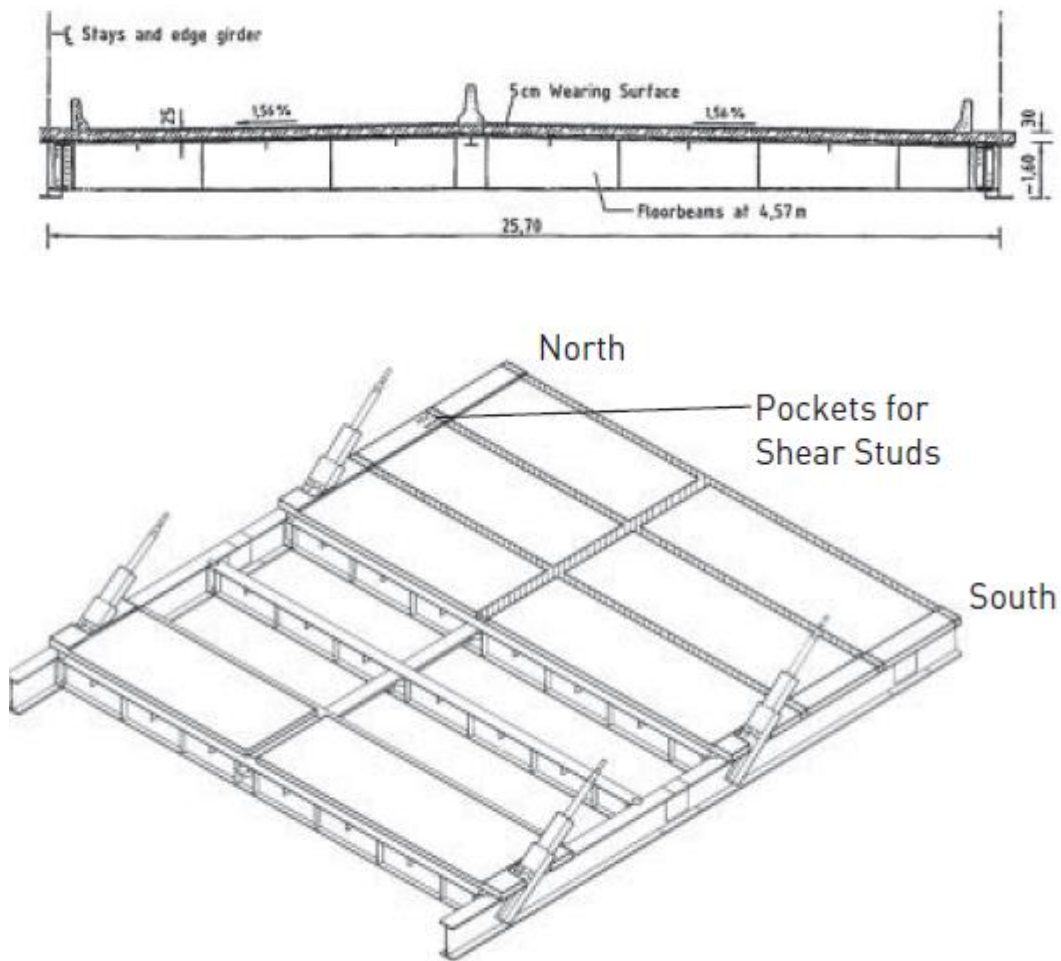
Steel Composite Cross Sections (Svensson, 2012)
